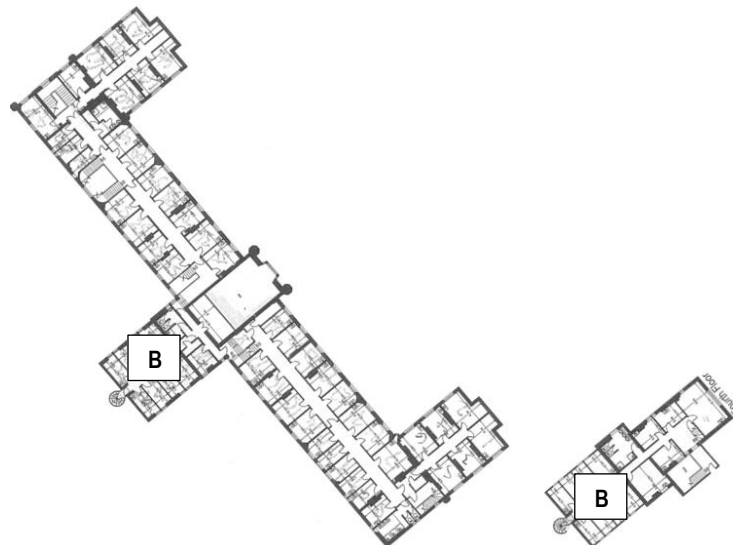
(left): Existing third floor. Note rear extension labelled B.
